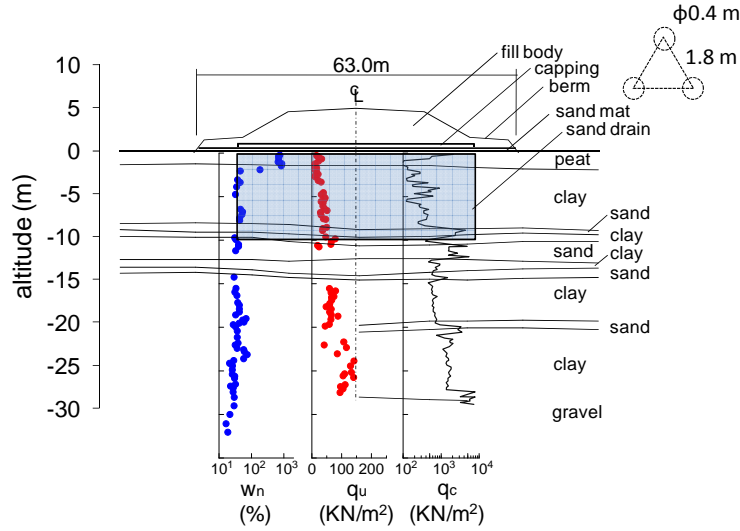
Cross section and subsoil properties of Ebetsu trial embankment (SD) [3]
